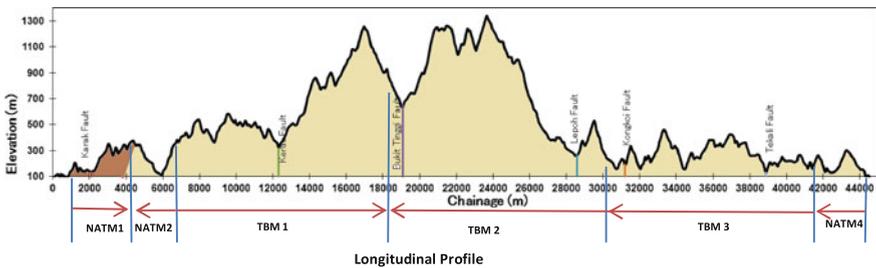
Typical section of tunnel and arrangement for tunnel work (NATM & TBM)
